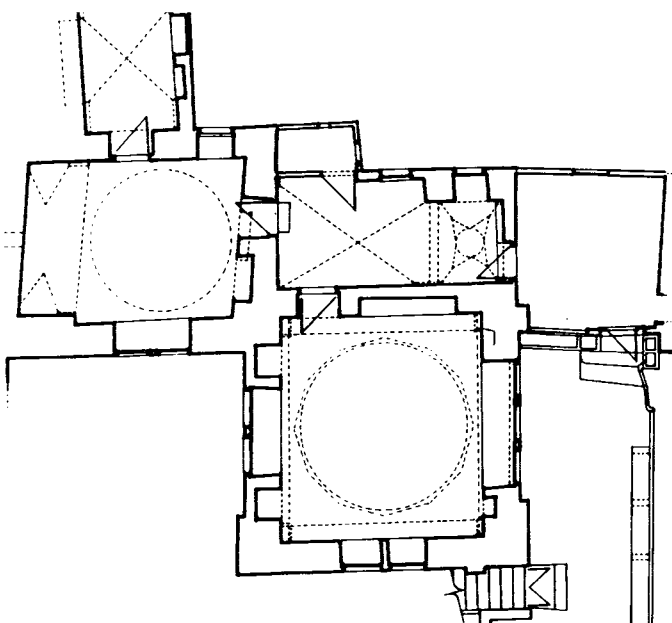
House on the Via Dolorosa, ground floor plan the 'Haramlik'.
